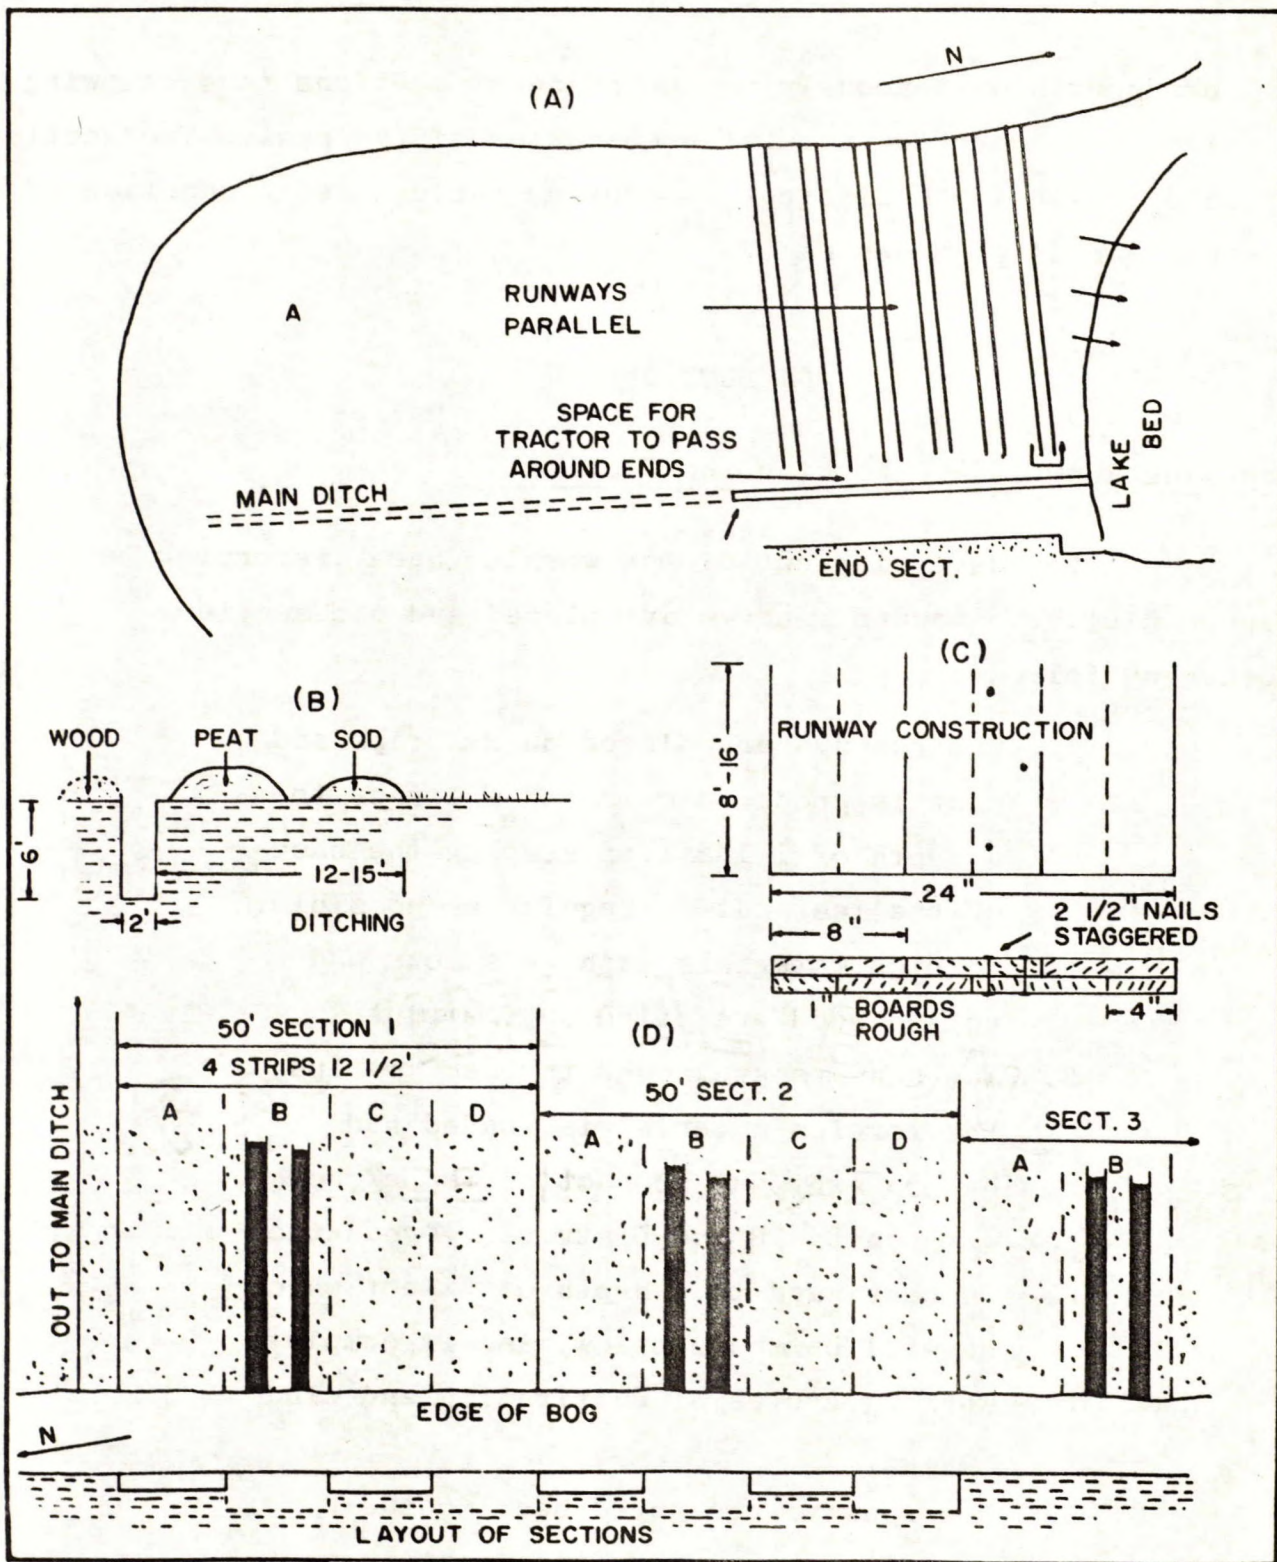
LAYOUT OF BOG AND RUNWAYS
